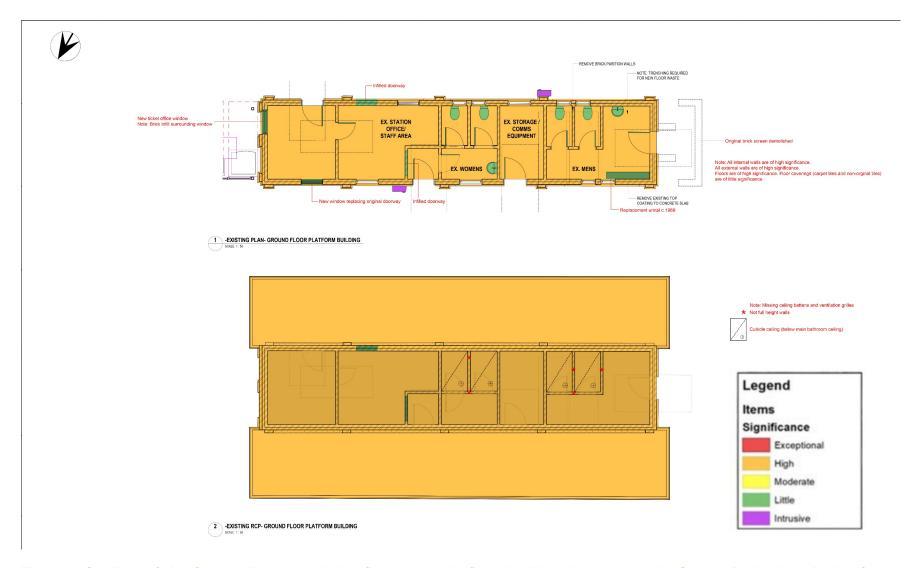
Gradings of significance diagram – existing floor plan and reflected ceiling plan, not to scale (Source: Design Inc with Artefact overlay)
